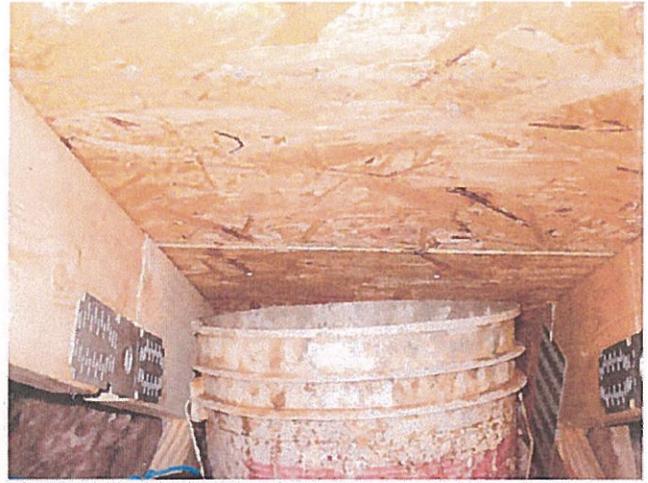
" water damage to ceiling and wall below stairs to third floor, temporary guard to stairwell down to first floor installed by Madison to prevent injury. "Decent, safe, and sanitary dwelling" includes, in part, that a dwelling "is weather tight" (§ 36-106).
